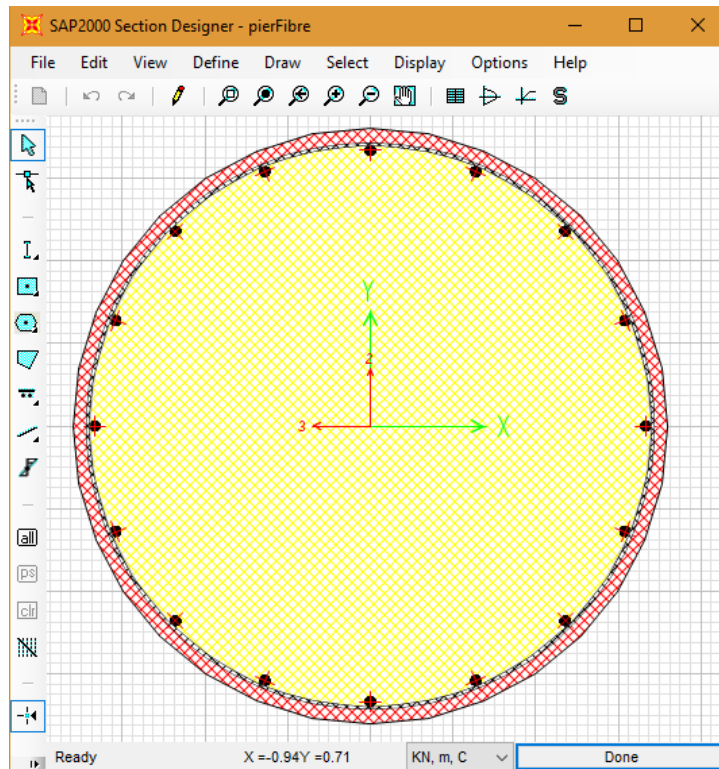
(a): Short Column Section Designed as per IRC:6-2000
